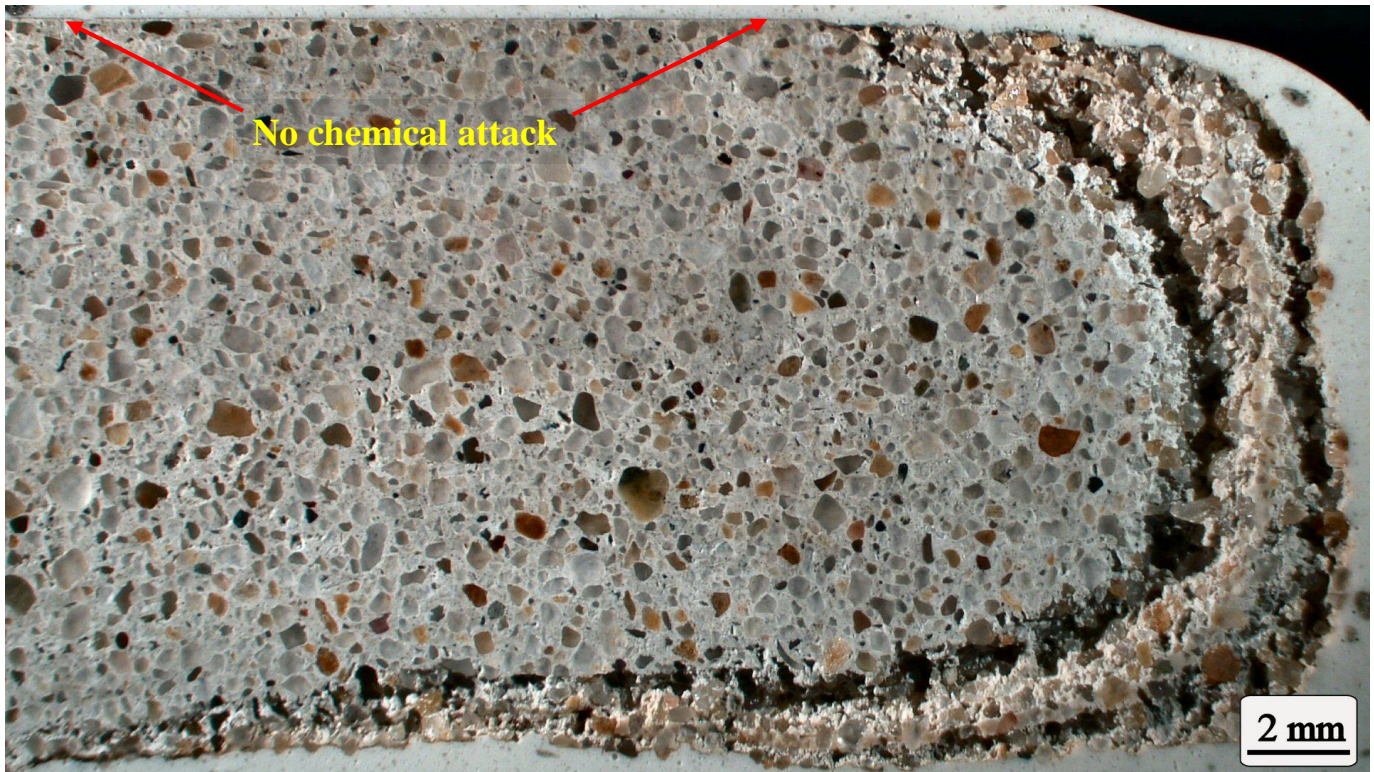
Photographs showing the grout sample in the as-received condition.
